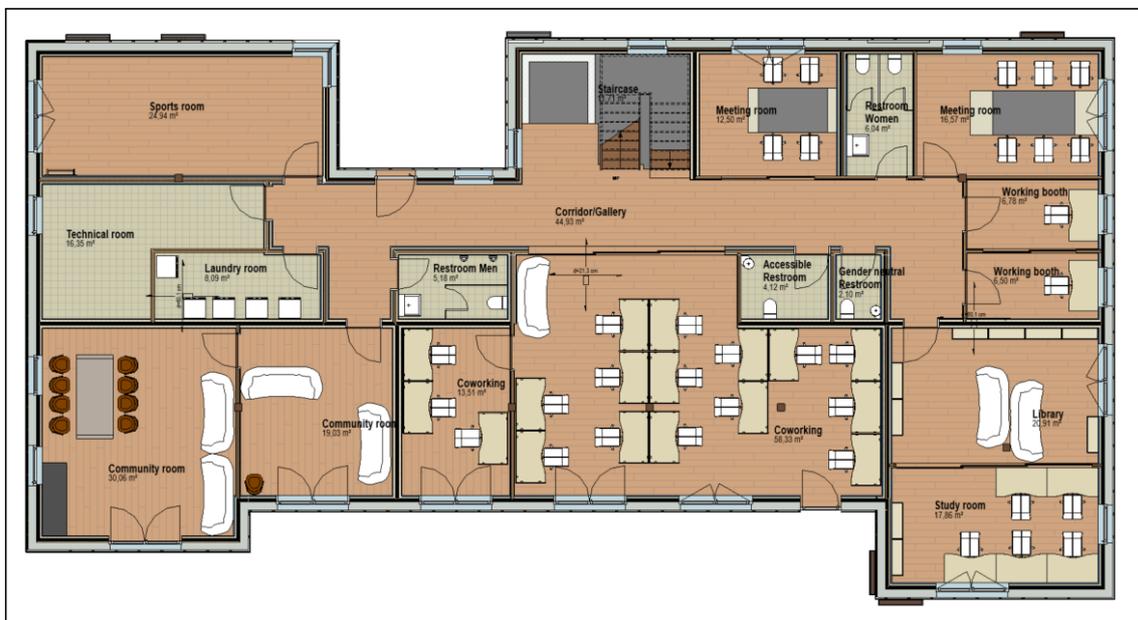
Floor plan of the ground floor with common areas (screenshot in *Revit*)
